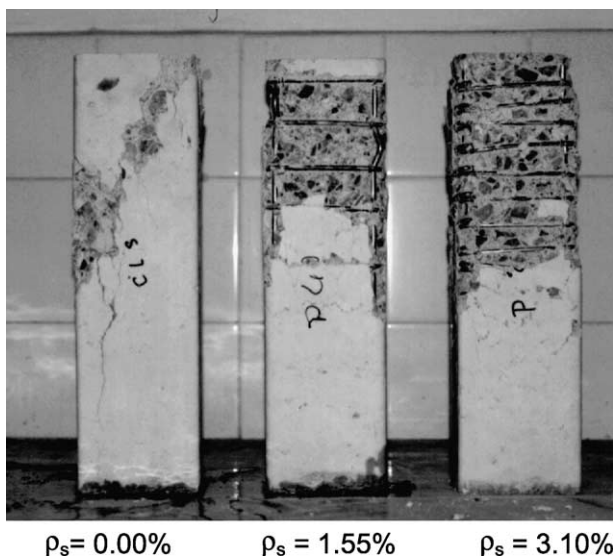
Mode of failure of expanded clay lightweight 100×340 prisms confined with steel stirrups.
